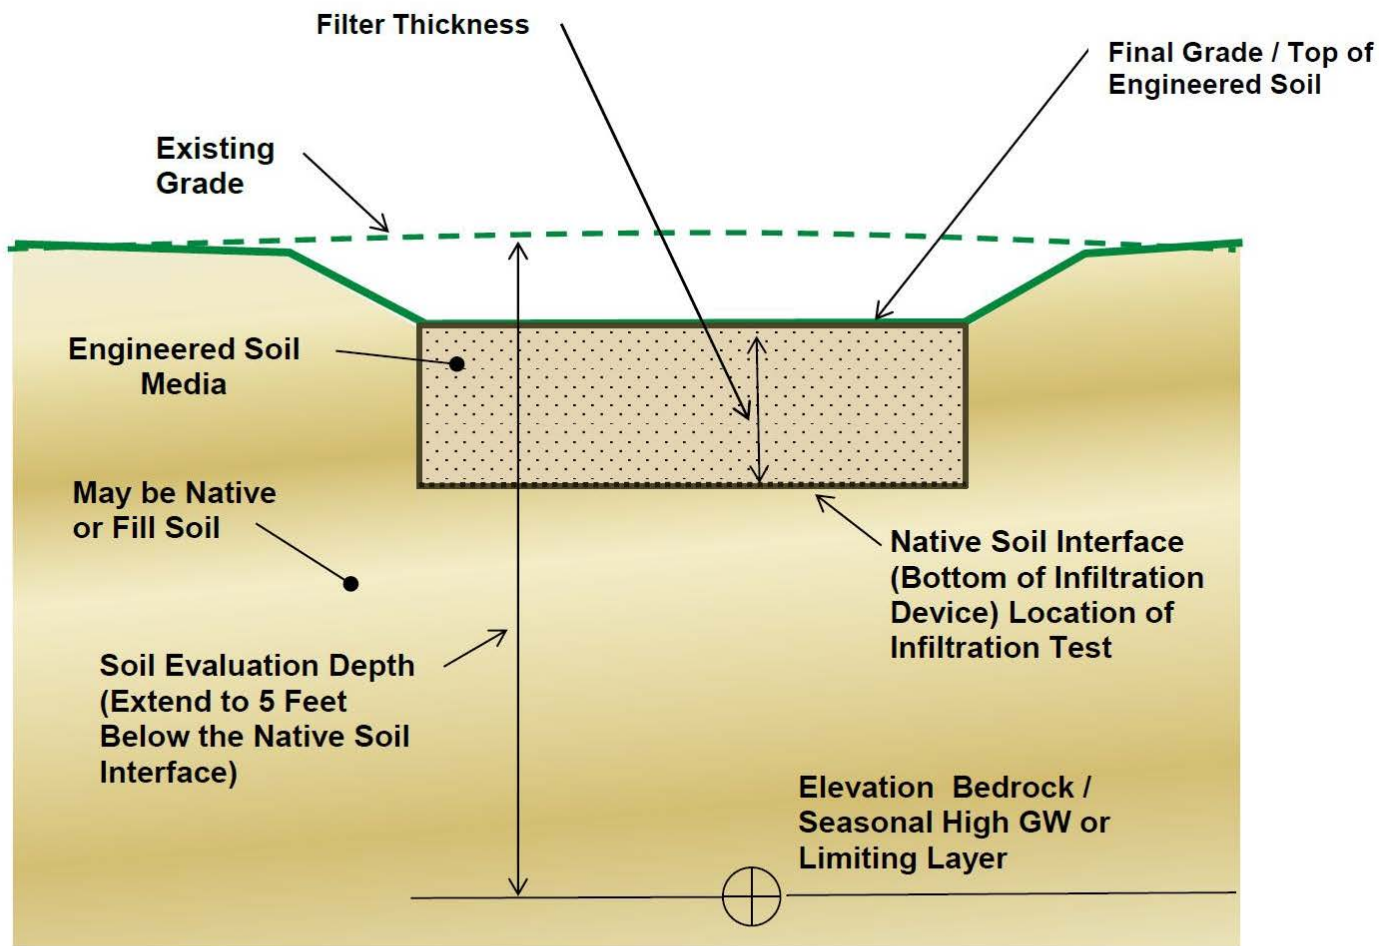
EXAMPLE BIORETENTION BASIN SECTION
